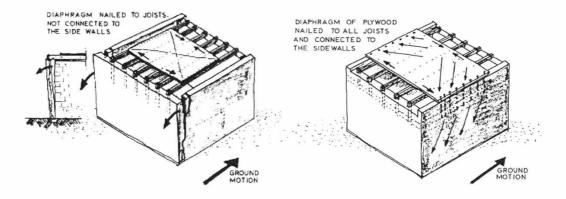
ROOF DIAPHRAGM FIXED TO ONLY TWO WALLS OR TO ALL FOUR WALLS
